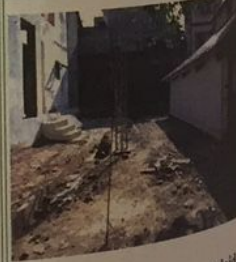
No protection wall at Saraswati School at Palaj (13.06.2017)
